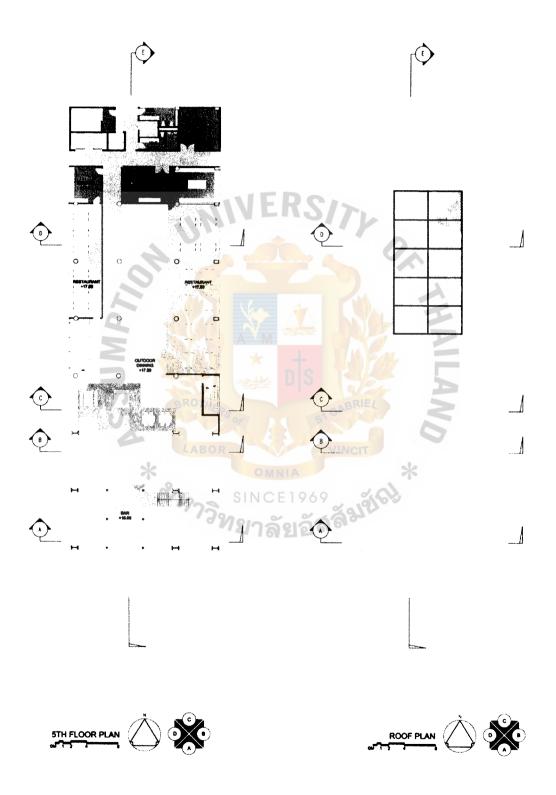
5th floor plan and Roof plan (Image Source: Author's image)
